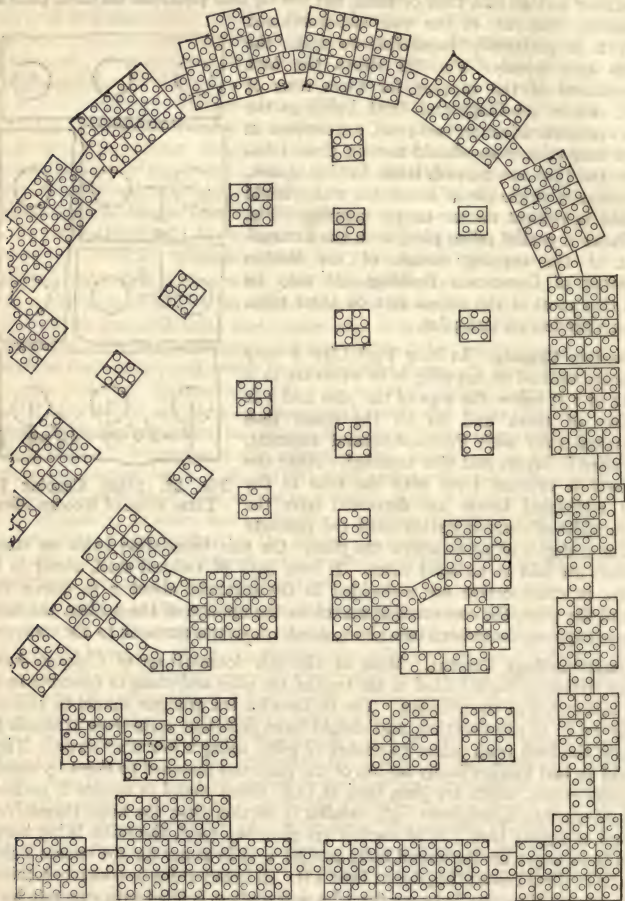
Piling-plan, Chamber of Commerce Building, Boston, Mass.
